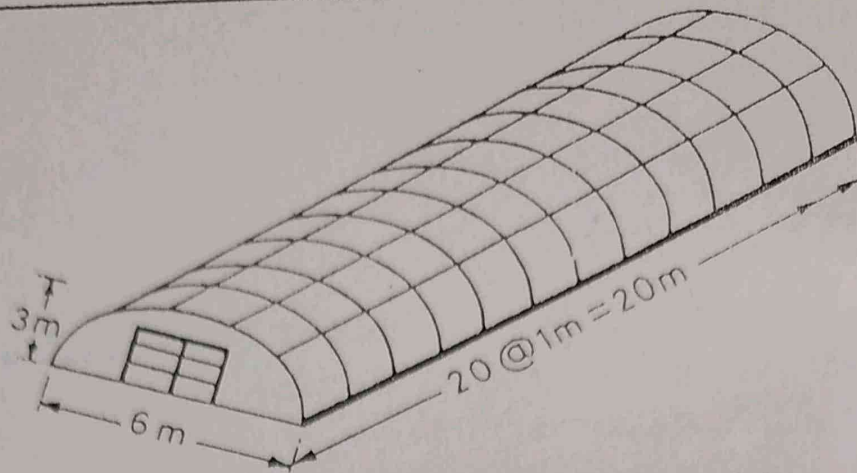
Schematic Diagram of Pipe Framed Green House.
